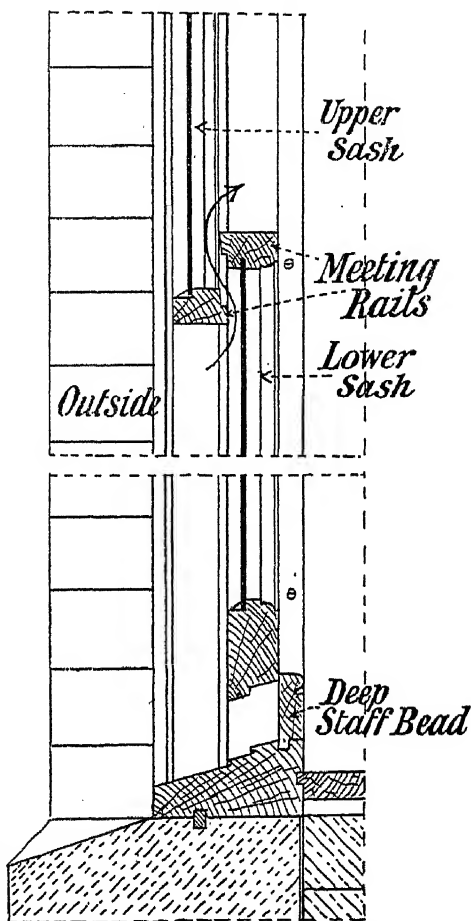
Vertical Section through the Meeting-rails and Sill of a Sash-and-frame Window.
